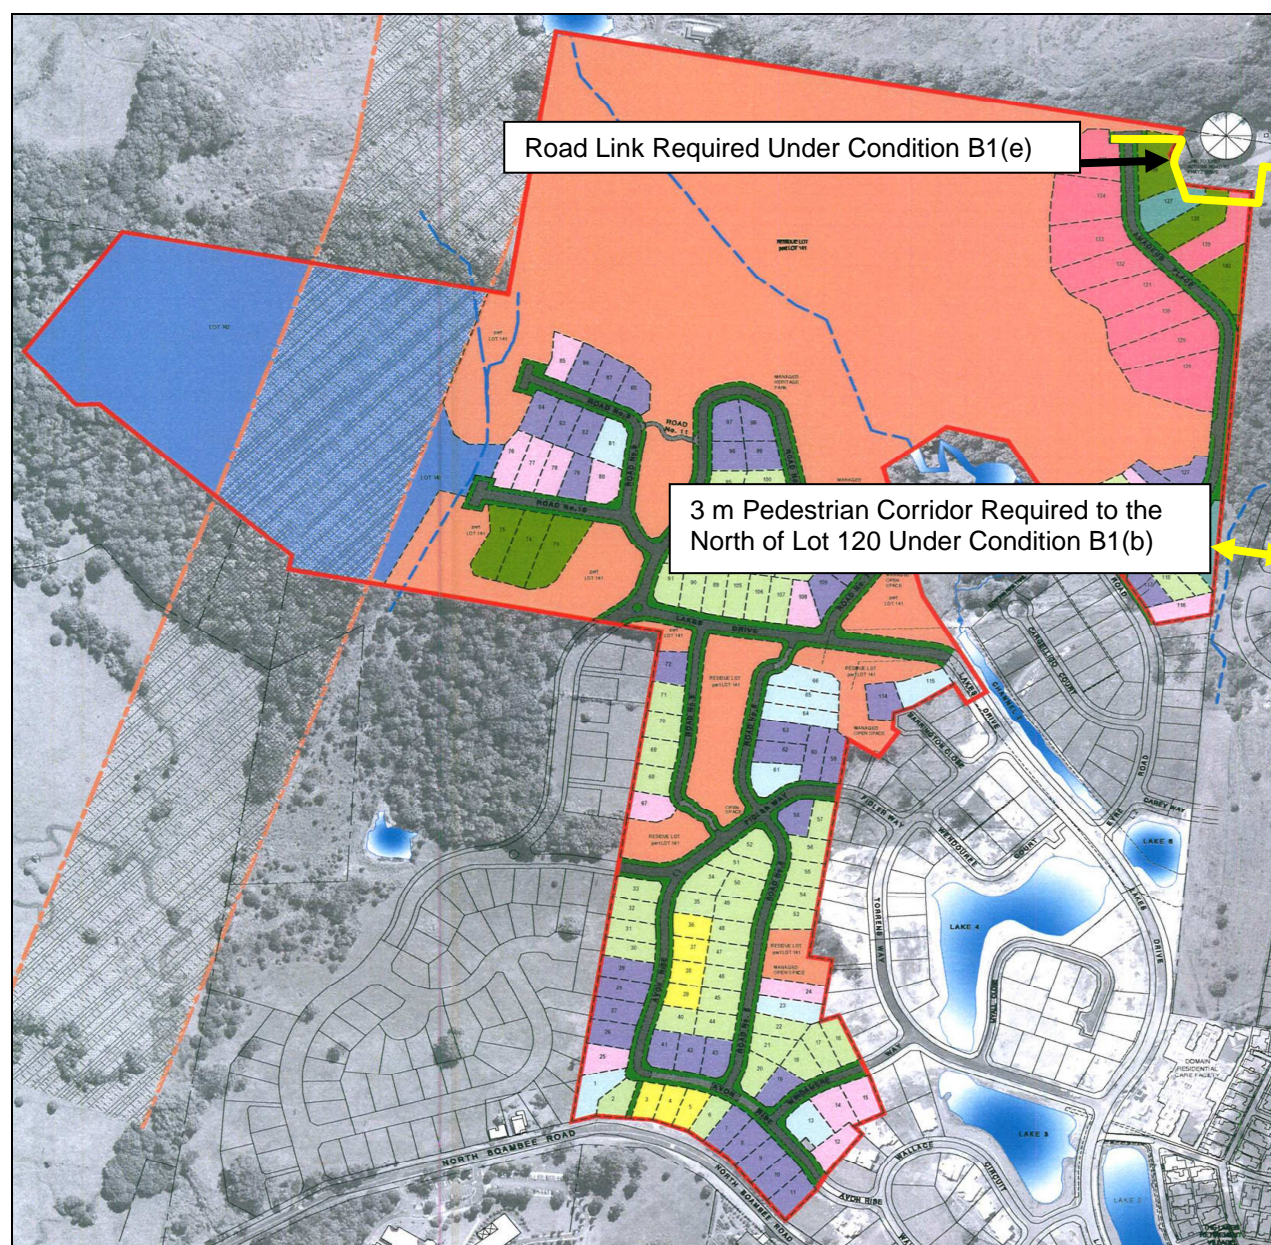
Pedestrian and Road Links Required under Condition B1(b) and (c)
